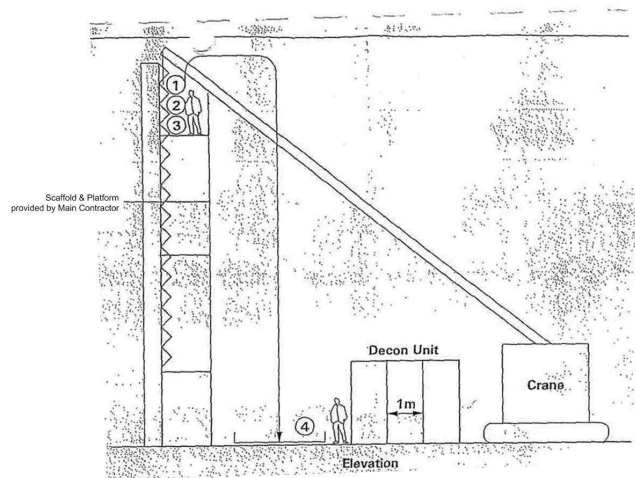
Layout Plan of DCM Removal Work in Chimney
